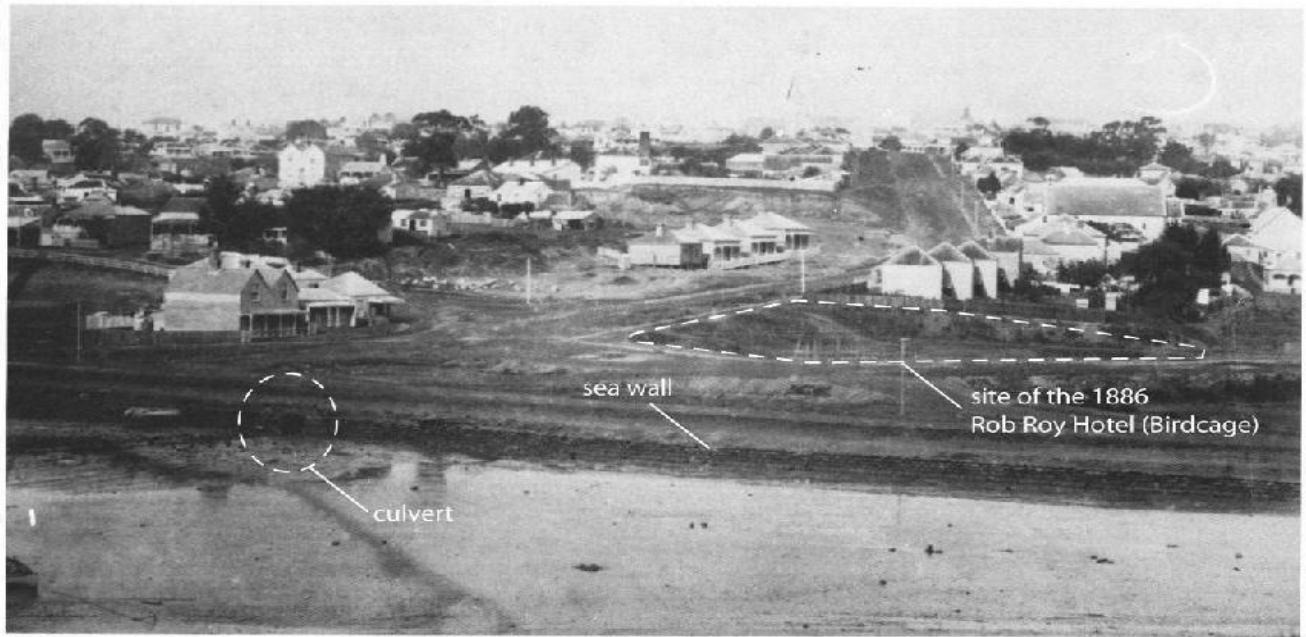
Undated photograph of Freemans Bay illustrating the Patterson Street sea wall and the culvert draining into the bay. The photo was evidently taken after construction of the sea wall (between 1873 and 1880), but before construction of the Rob Roy Hotel (construction began in 1885 and finished in 1886). The site of the Rob Roy Hotel is indicated (photo: Broomhall, Auckland War Memorial Museum, C16406)
